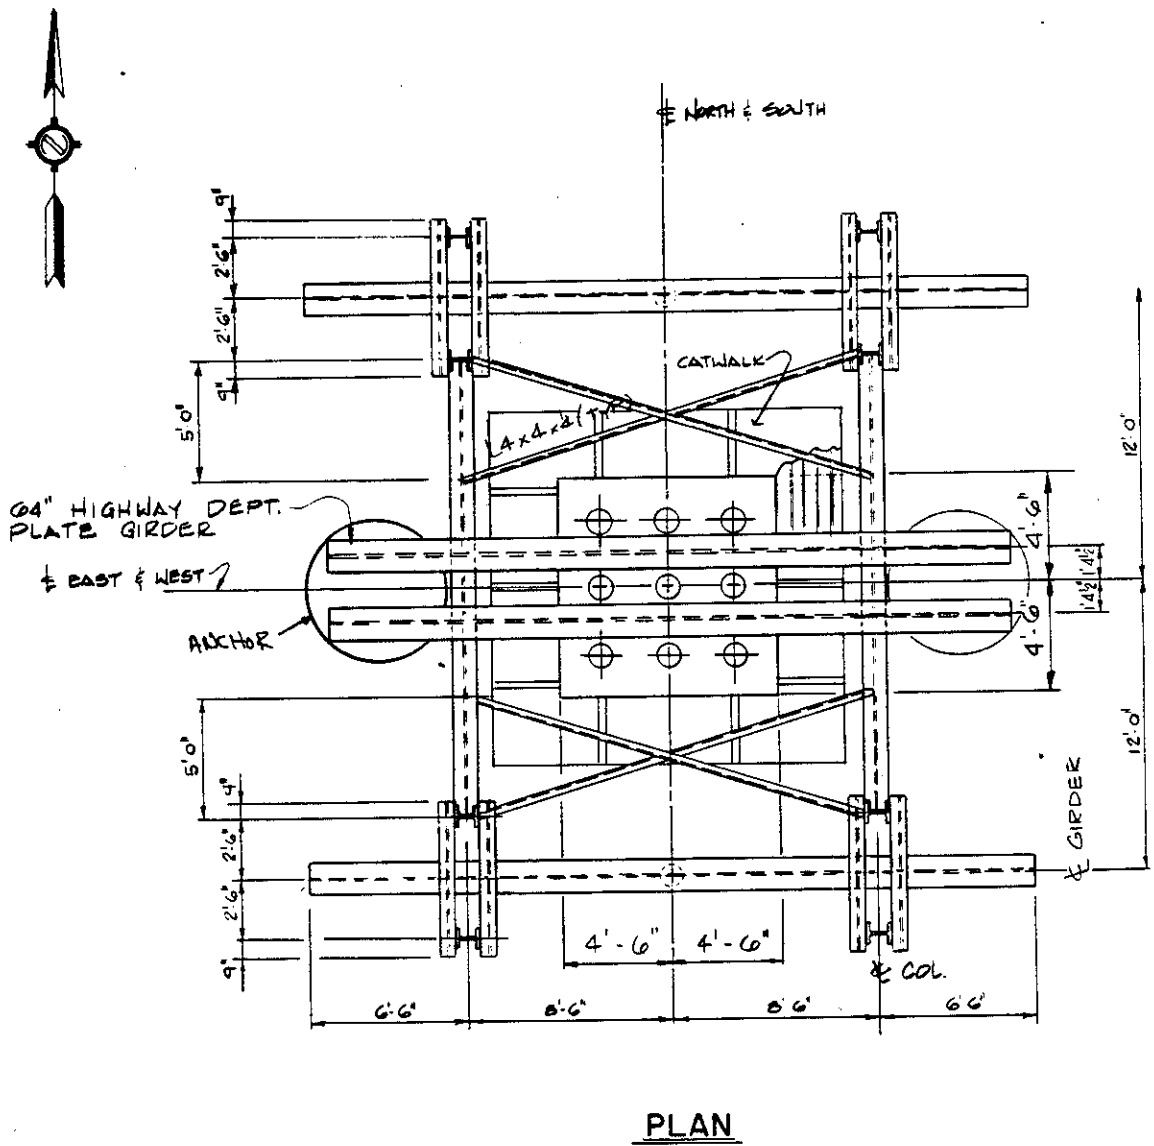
REACTION STRUCTURE; PLAN VIEW (1 ft = 0.305 m; 1 in = 25.4 mm)
